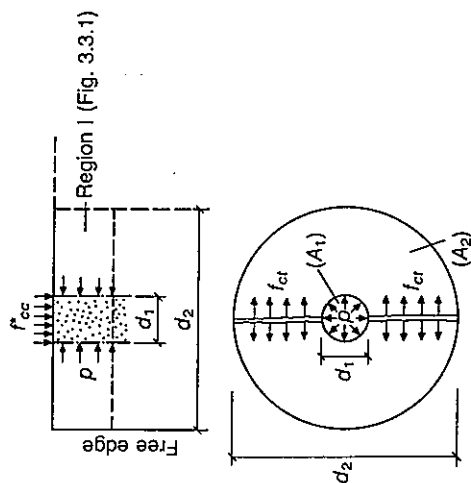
Transverse expansion of concrete near a partially compressed end-face, including transverse cracking (spalling)
